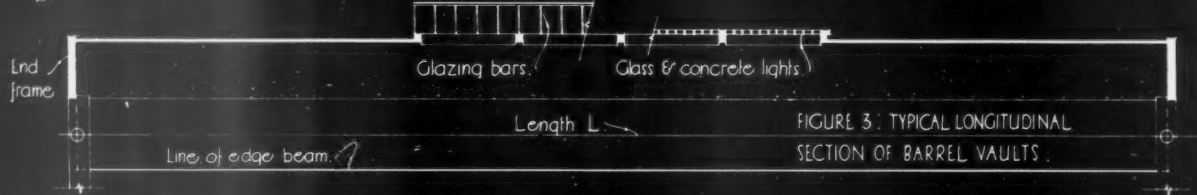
TYPICAL LONGITUDINAL SECTION OF BARREL VAULTS.
